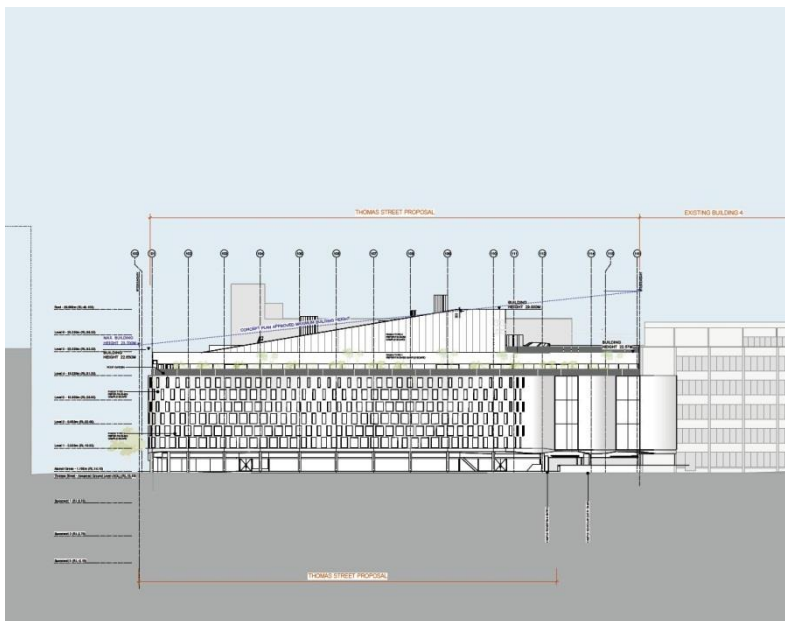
Building height – Alumni Green (south) elevation (Source: DBJ+BVN)
